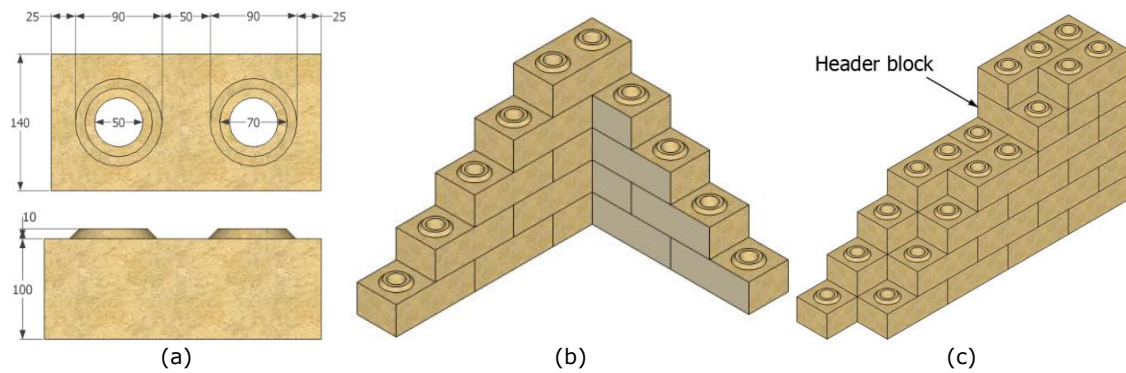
Dry-stack interlocking CEBs masonry system (Sturm et al., n/p): (a) dimensions of the block (in mm); (b) single-leaf wall; (c) double leaf-wall.
